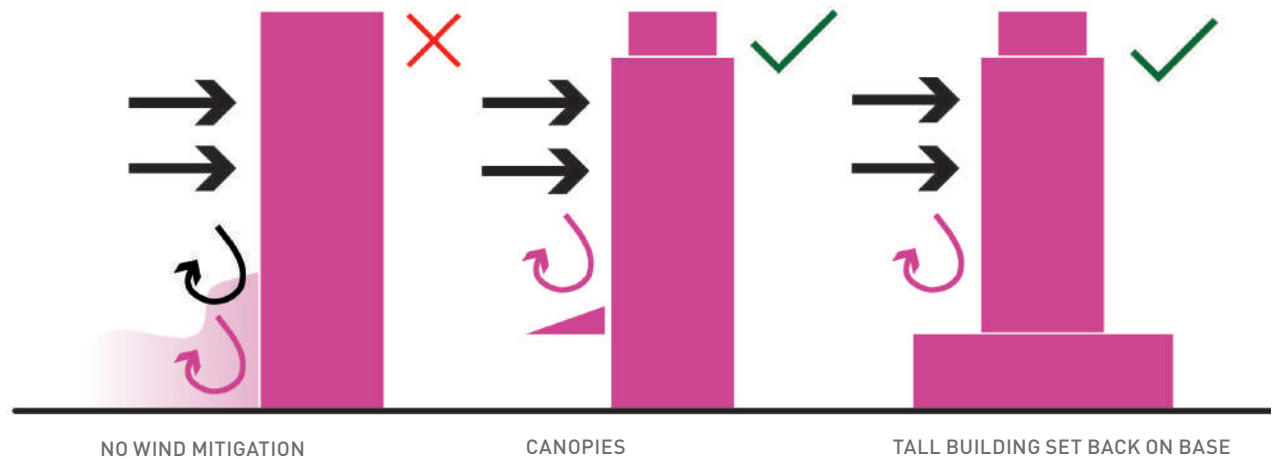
Good design of tall buildings should mitigate excessive wind at ground level
